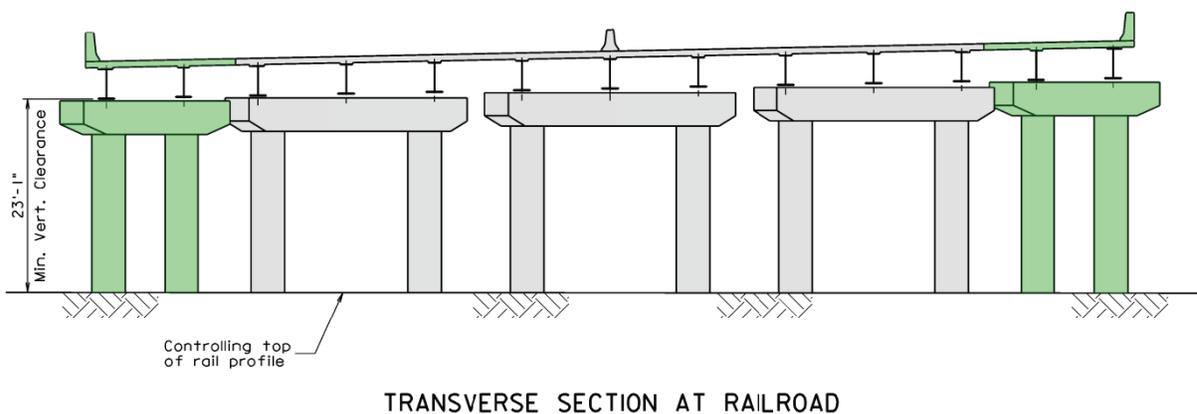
(c)(2): Future Widened Bridge (Green) Clearance to NS Top of Rail
